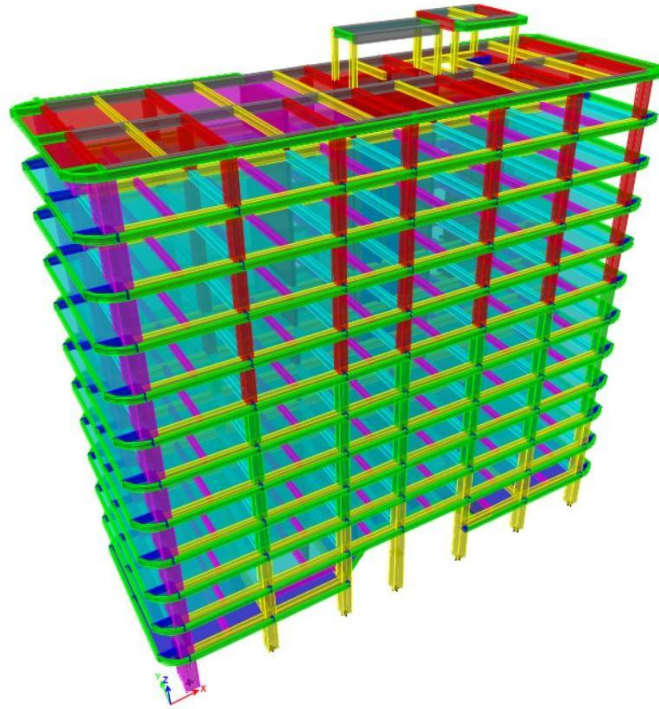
3D Structural Modeling of the Techno BRI IT Raganan Building
